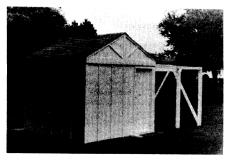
Rolling Ridge Observatory as it sits in my backyard. The peaked roof design was selected to accomodate snow loadings and to complement other structures in the neighborhood.
